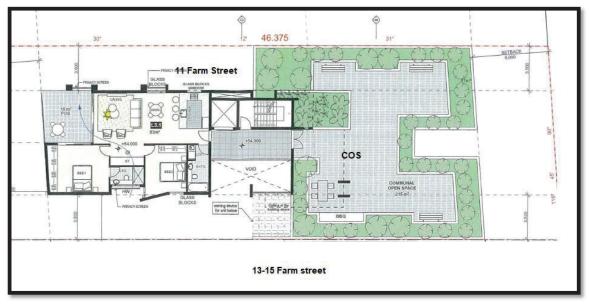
11 Farm Street – location of the adjoining property's communal open space area.
